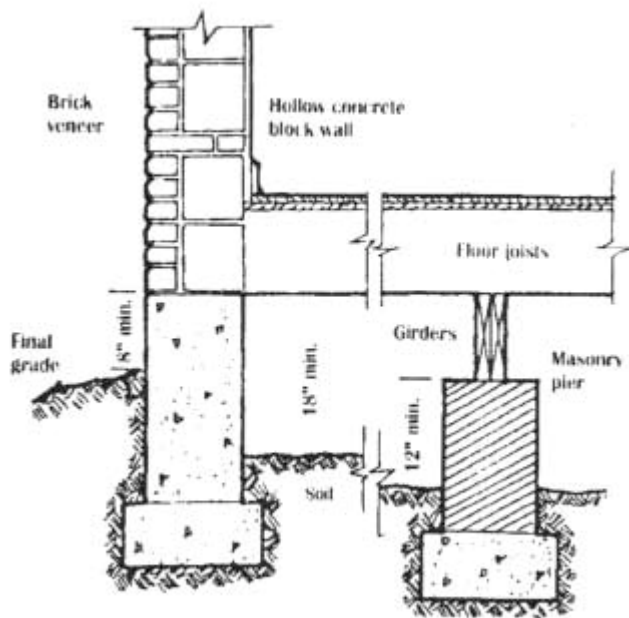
Crawlspace construction (illustration courtesy of MSUE)
